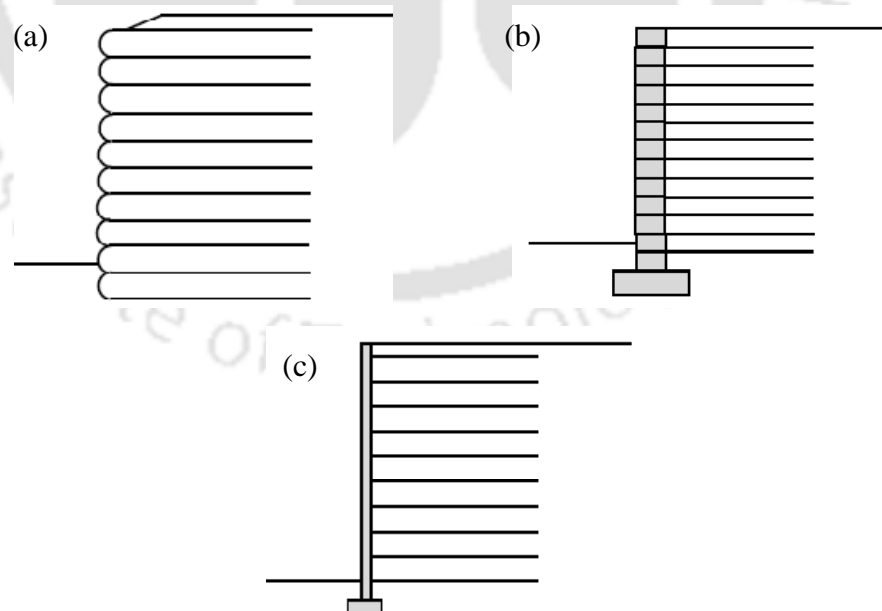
Typical system of reinforced soil structures: (a) wrap-faced wall (b) modular block wall and (c) full-height rigid-faced wall (redrawn from Holtz 2001)
